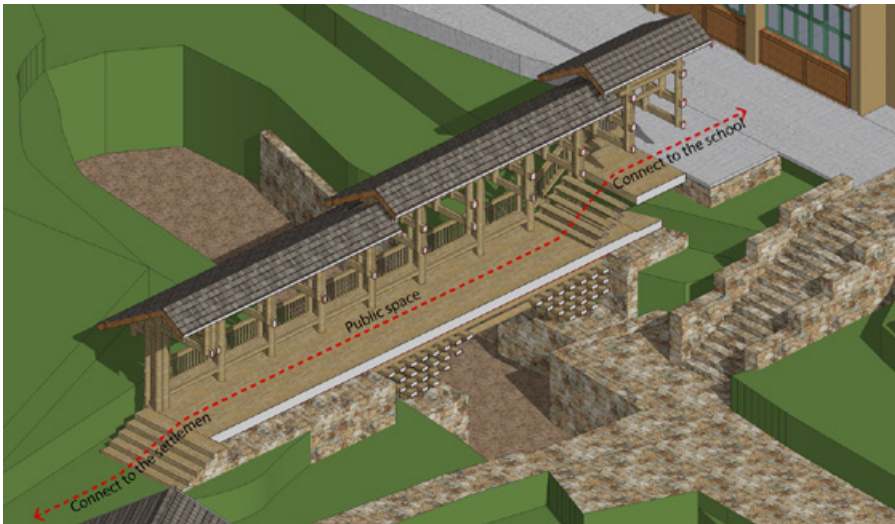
The new pedestrian bridge which provided an additional social function and created a small-scale public space in the village. (Source: Author)
